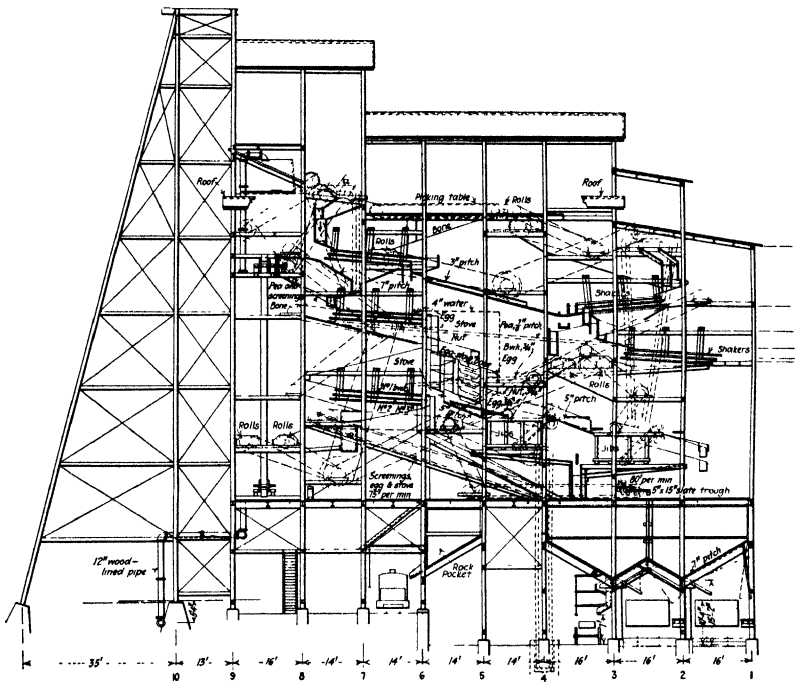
ELEVATION OF WANAMIE BREAKER SHOWING ARRANGEMENT OF MACHINERY.
